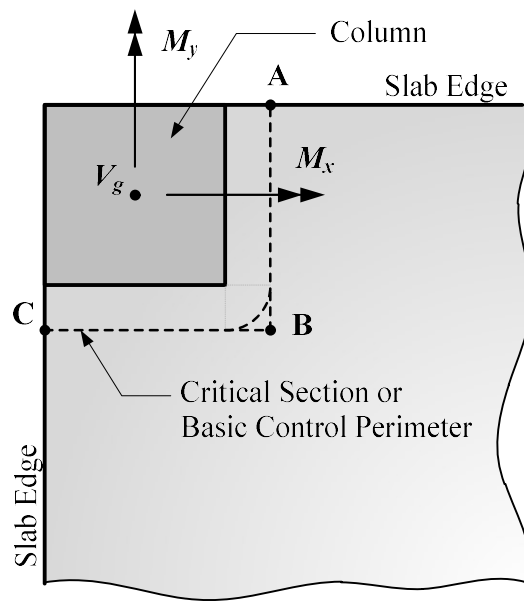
Points of Interests for a Corner Slab-Column Connection
